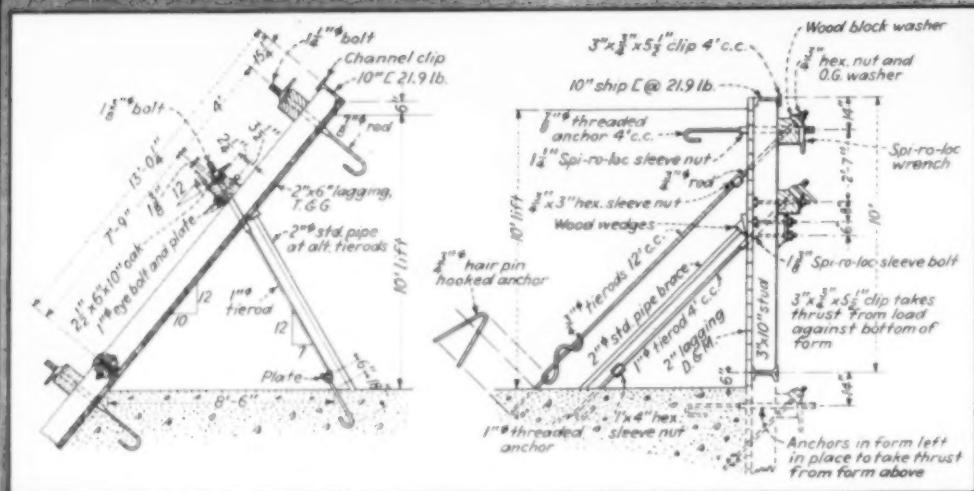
TYPICAL DOUBLE-ROW PANEL DESIGN is employed in forming 10-ft. concrete lifts of lock walls at Pickwick Landing, third in list of eight dam projects so far undertaken by TVA.
